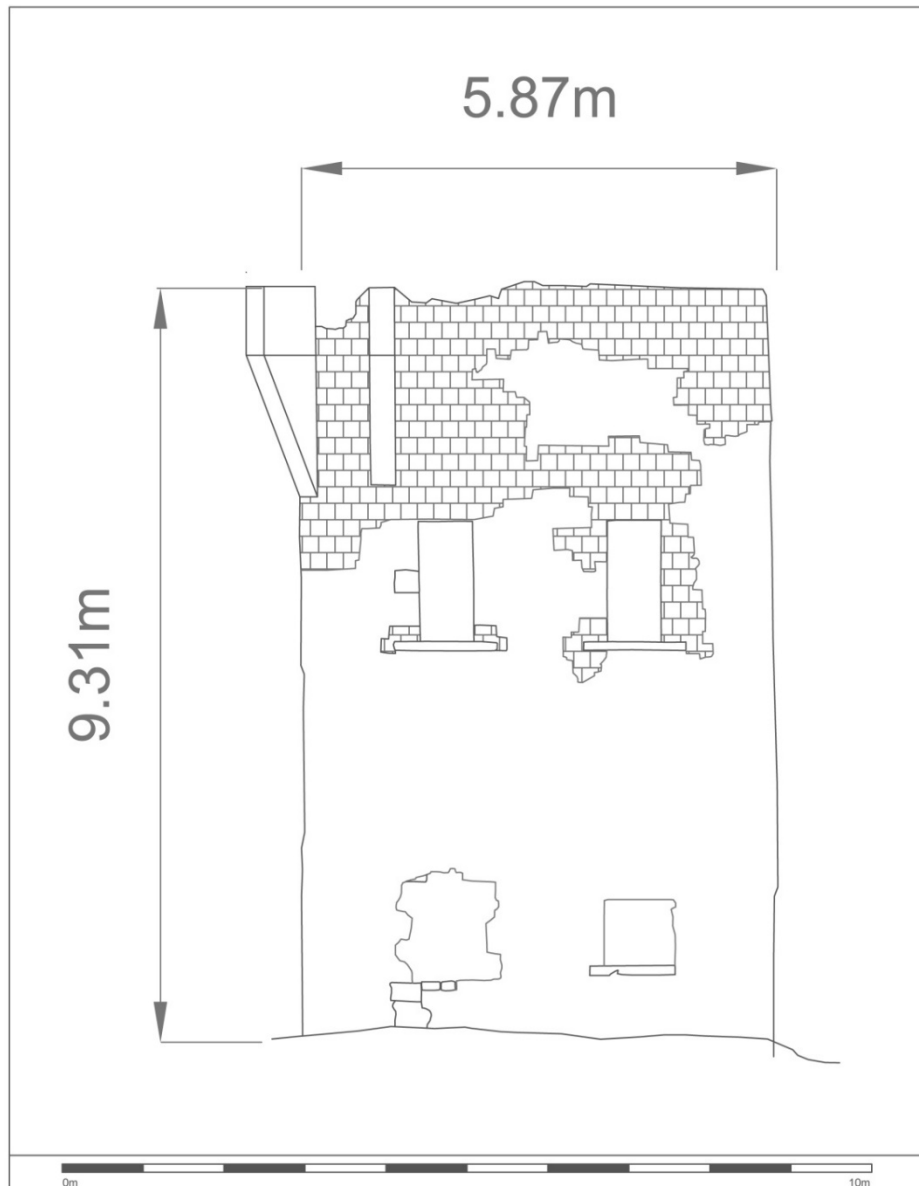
External elevation of the north-west wall of the signal tower at Inishmore Signal Station.
